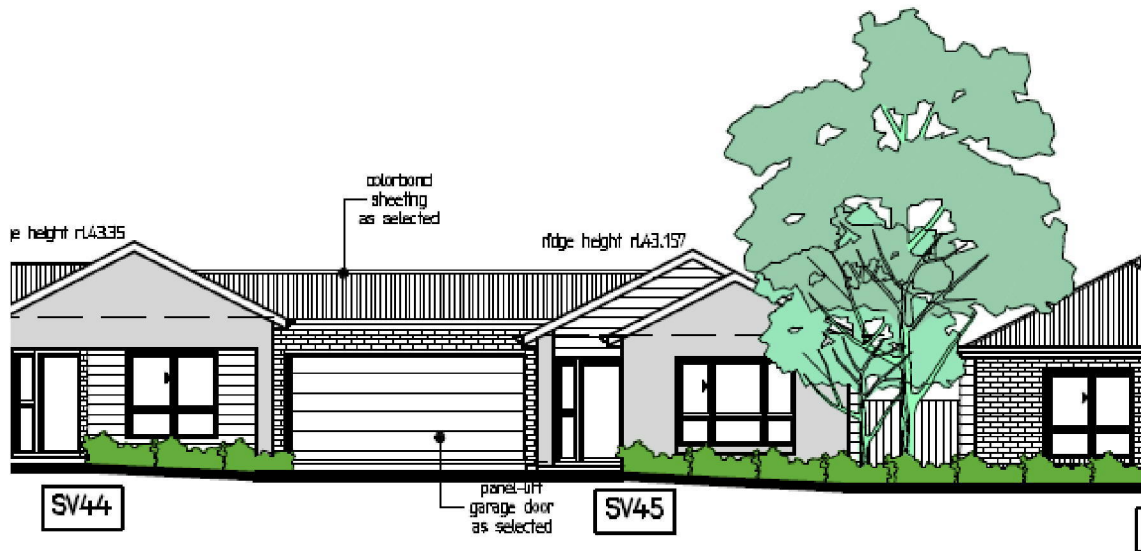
Extract of Villa SV45 from approved plan detailing approved gable design
